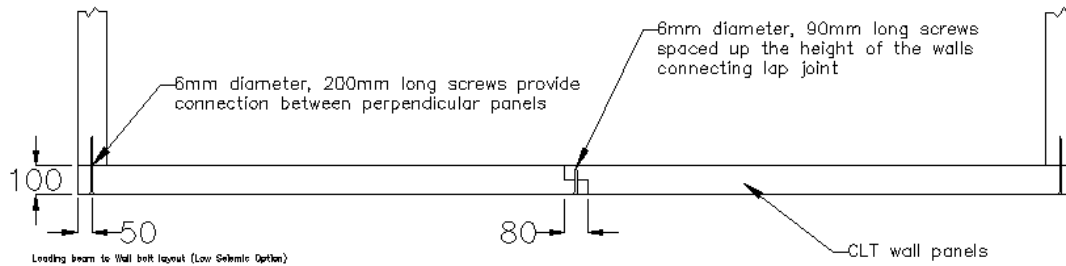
Plan view of the core showing orientation of the panels and features
